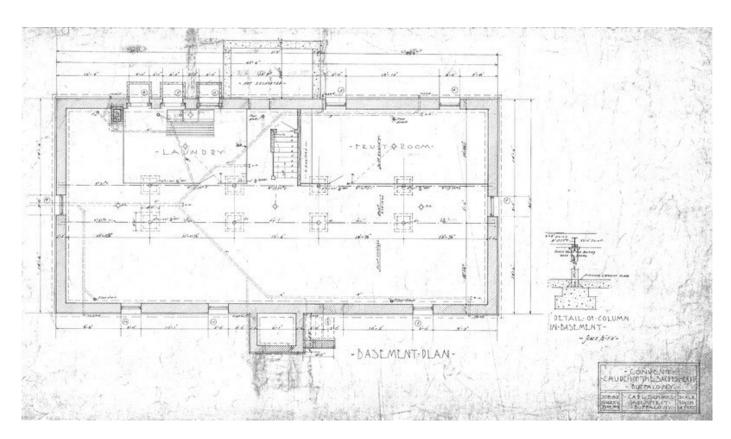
Basement Floor Plan, Convent, Church of the Sacred Heart (1913)
